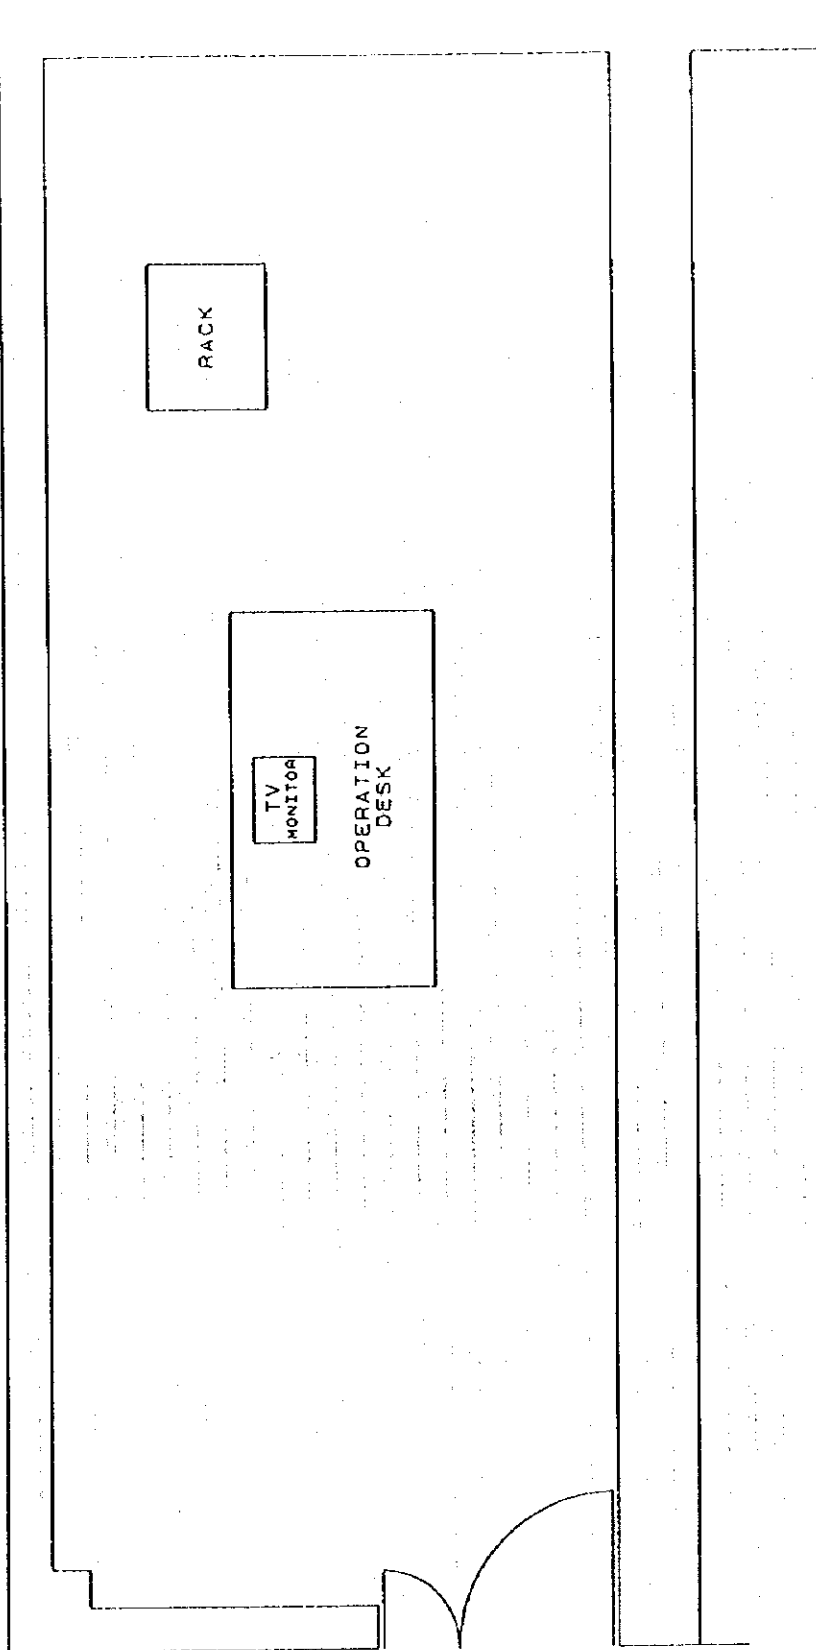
PHNOM PENH TV STATION, RADIO CONTROL ROOM EQUIPMENT LAYOUT
